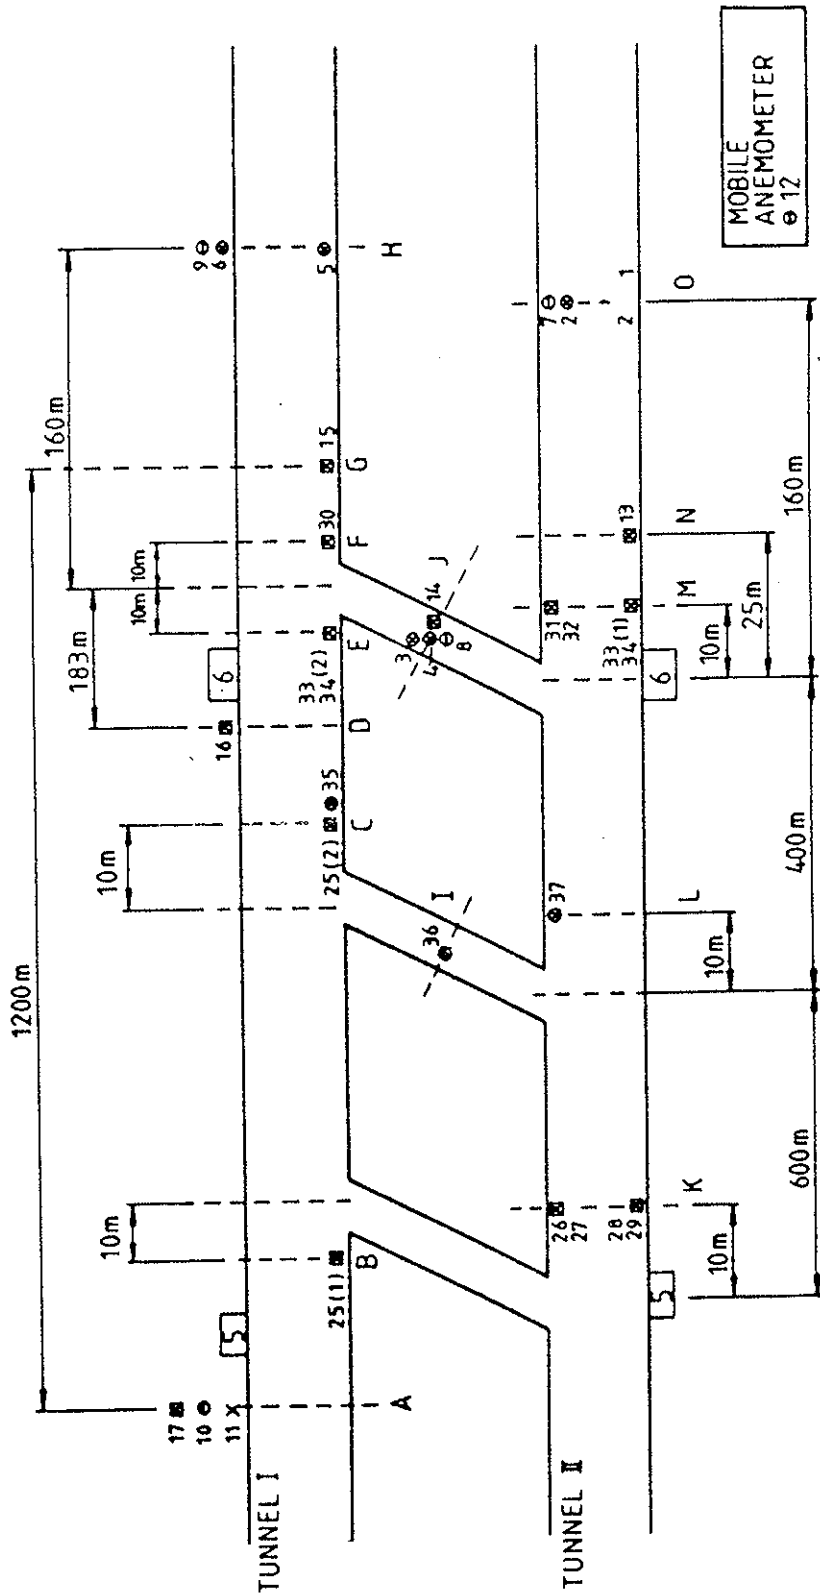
LAYOUT OF INSTRUMENTATION IN TUNNEL I
